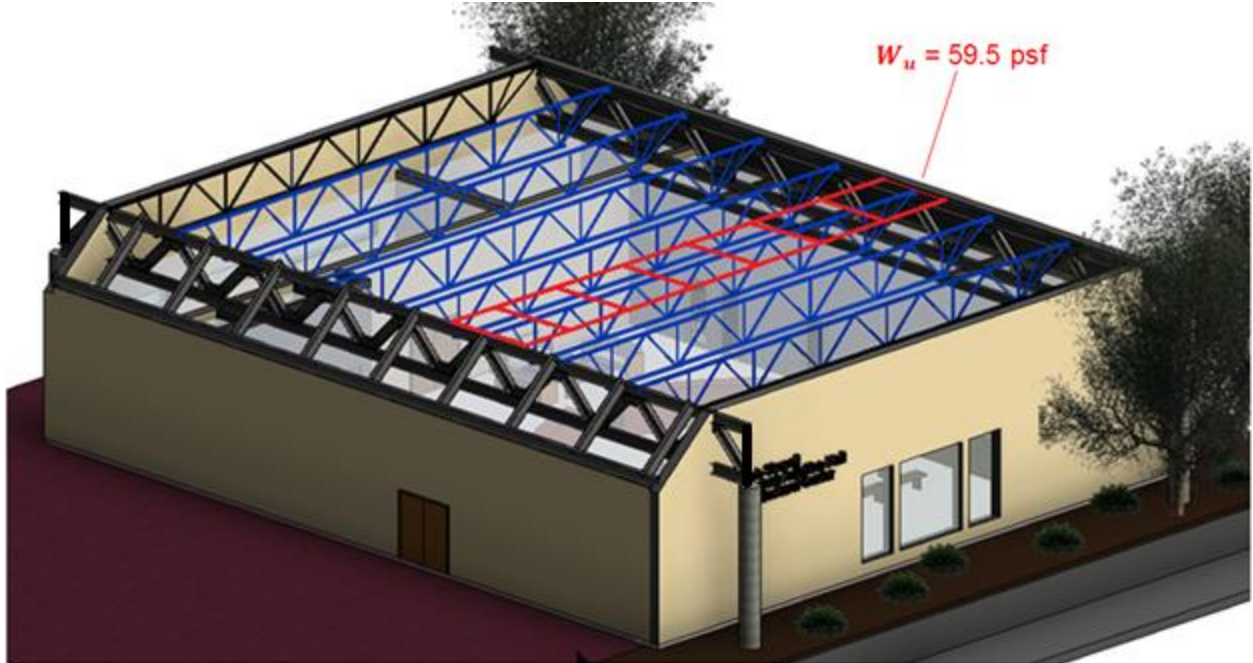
A 3D capture of the renovated MCC, highlighting the steel truss joists.
